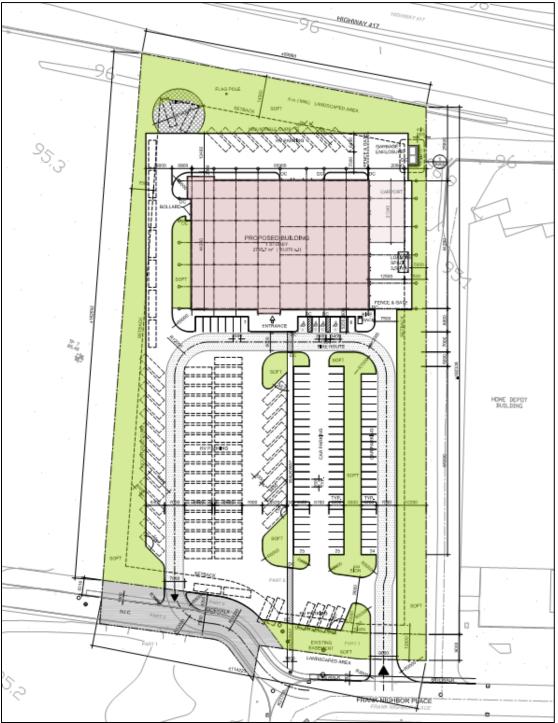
Site Plan for 20 Frank Nighbor Place, showing private street over 30 Frank Nighbor Place.
